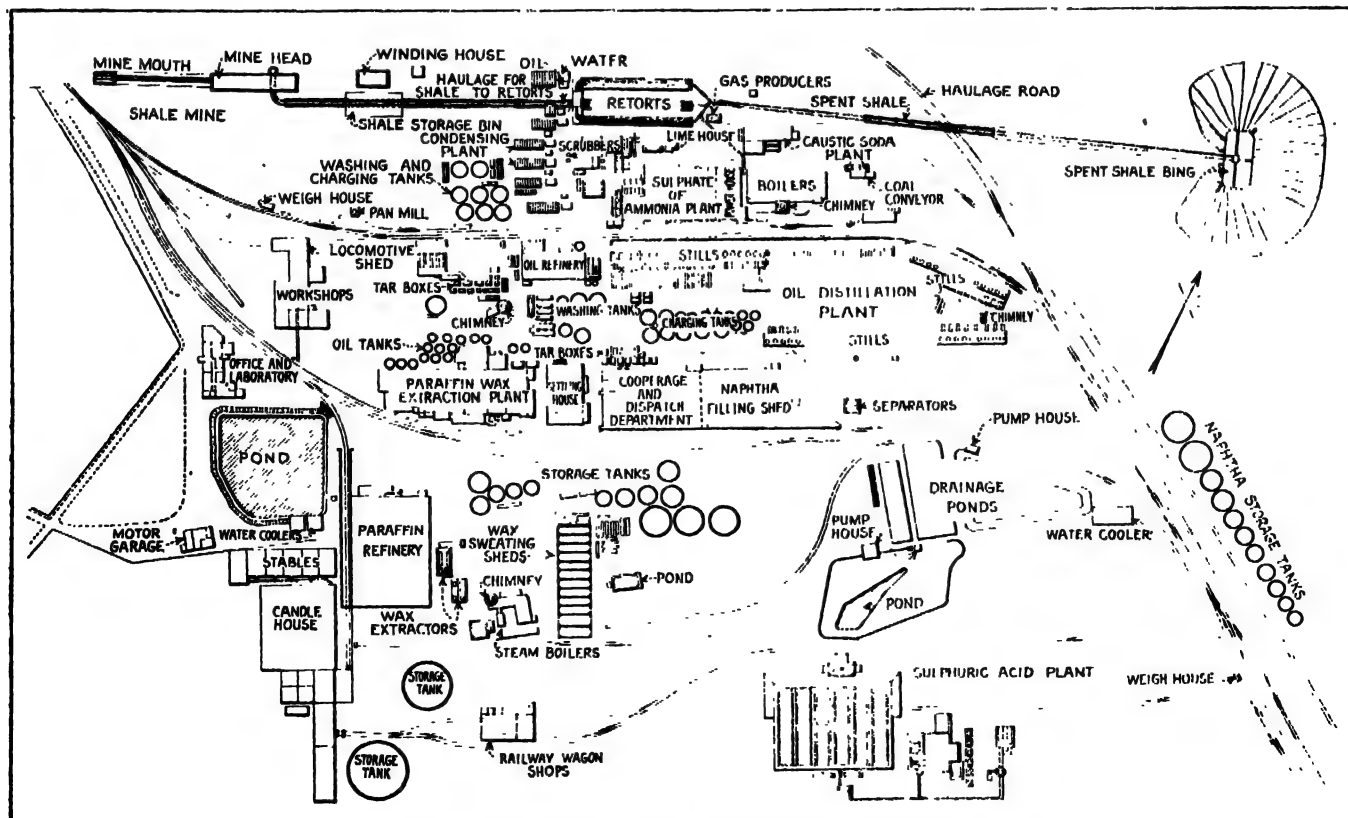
PLAN OF TYPICAL SCOTCH SHALE WORKS
